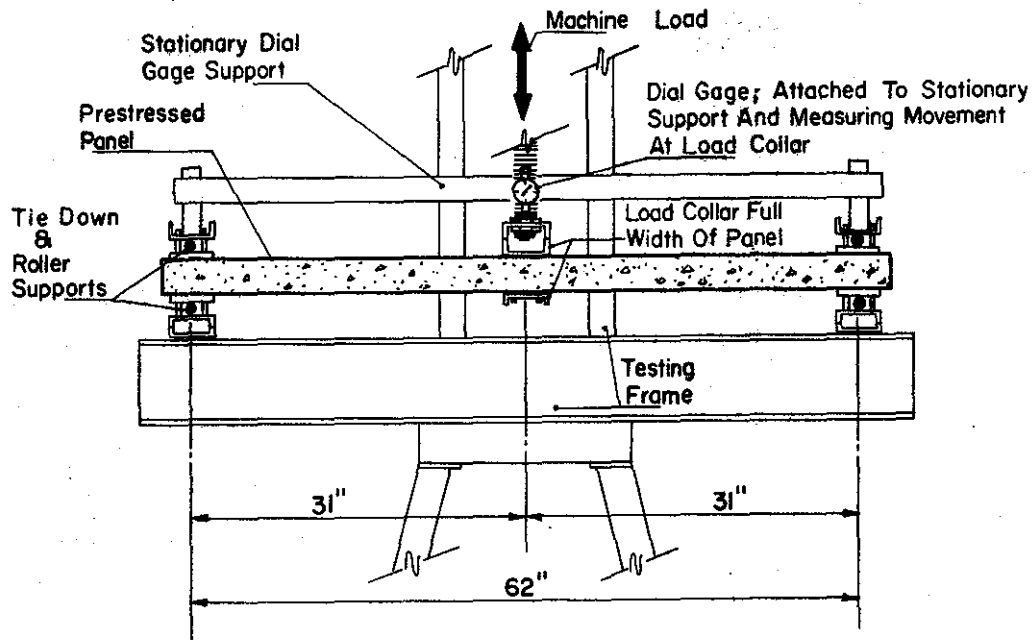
TEST SETUP FOR FATIGUE LOADING OF 68 IN. LONG PANELS
